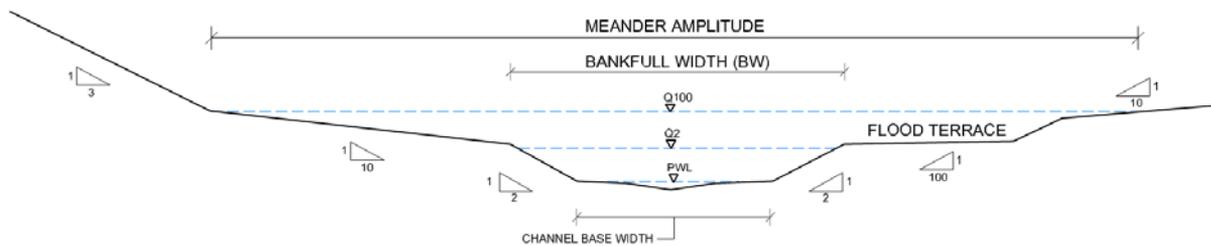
Typical section of the Roslyn Stream realignment in terms of flooding profiles
